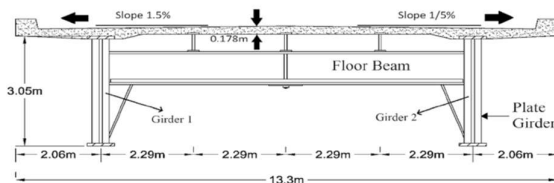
The cross section of the I-40 Bridge. (Adapted from Farrar et al (7, 16)).
